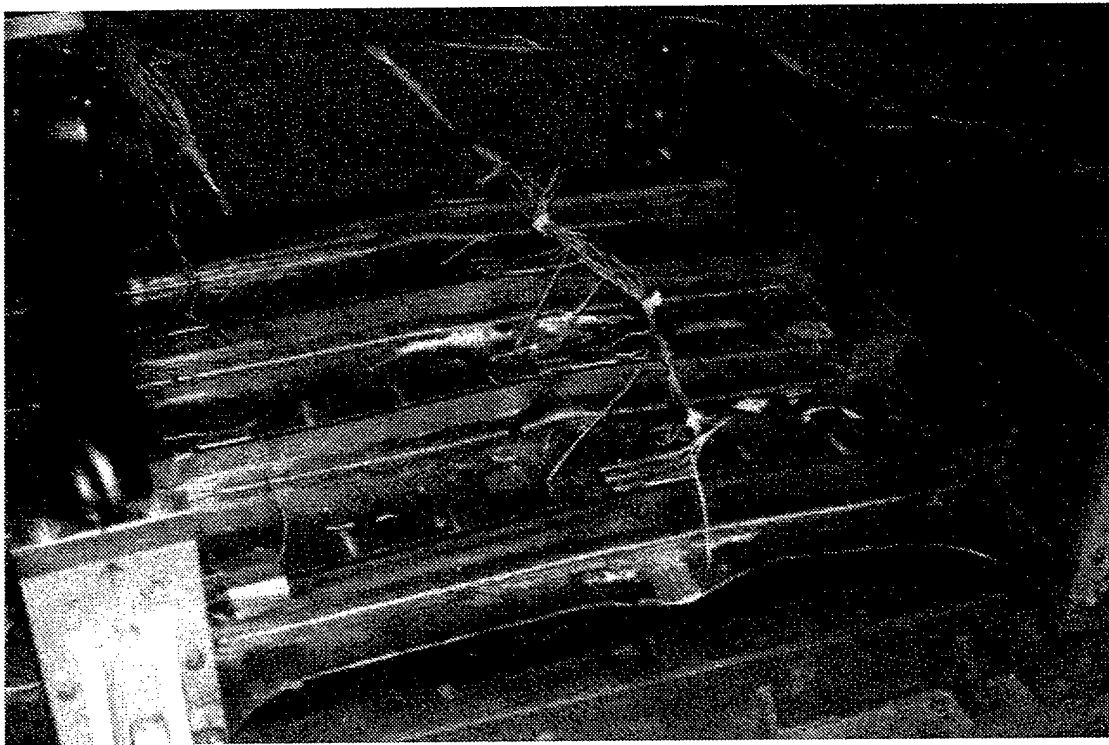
Grillage 0494 in Test Fixture after Collapse
